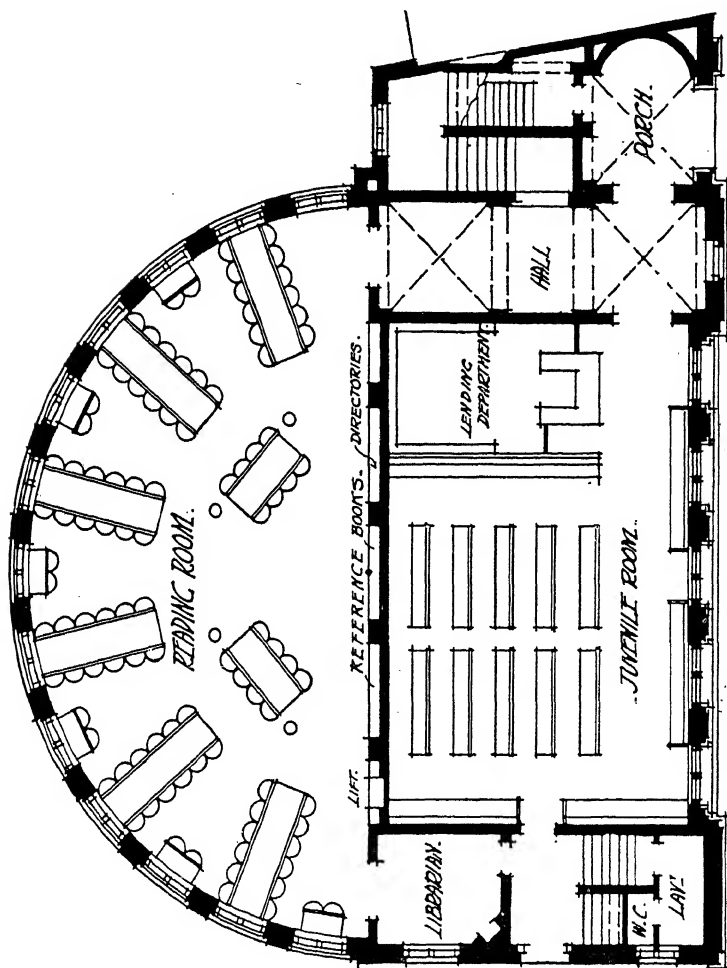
North Branch Library, Islington, Ground Floor Plan (Section 174).
